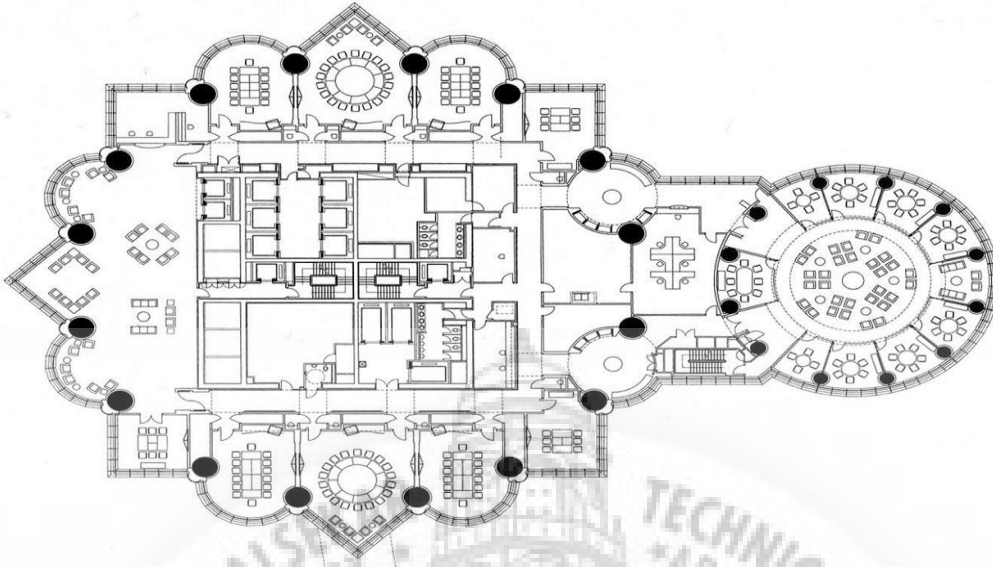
Petronas Tower Ground Floor Plan (Source – archute)
